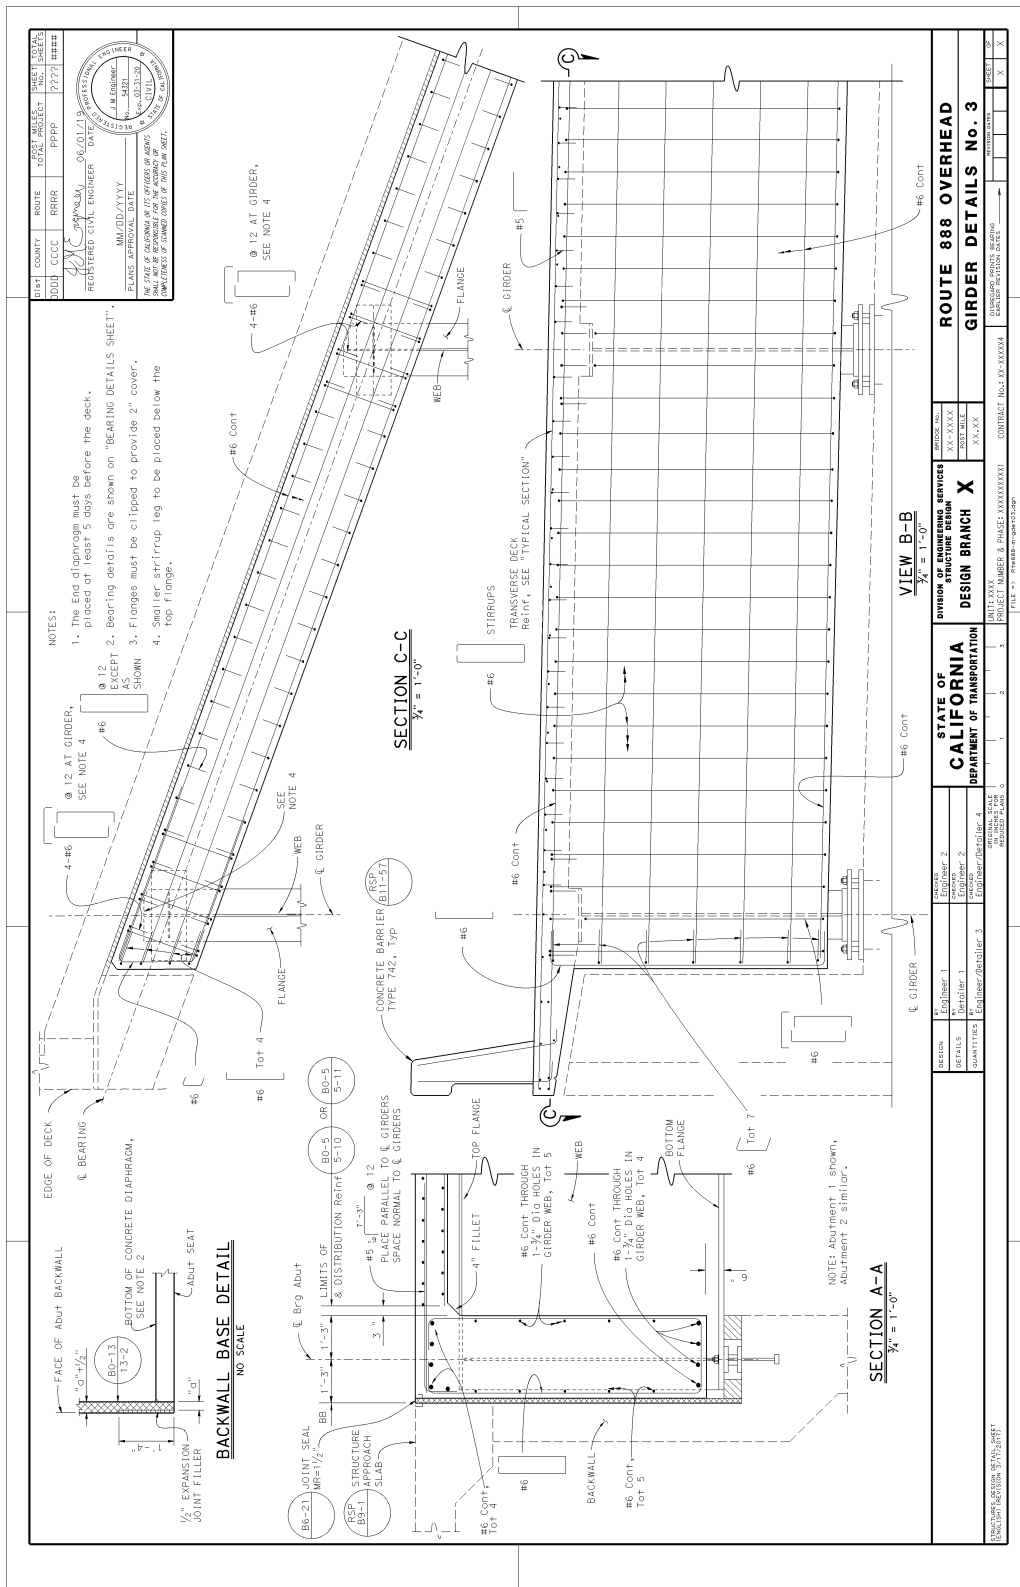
A.A.13 Steel Girder Bridge Detailing Example 13
